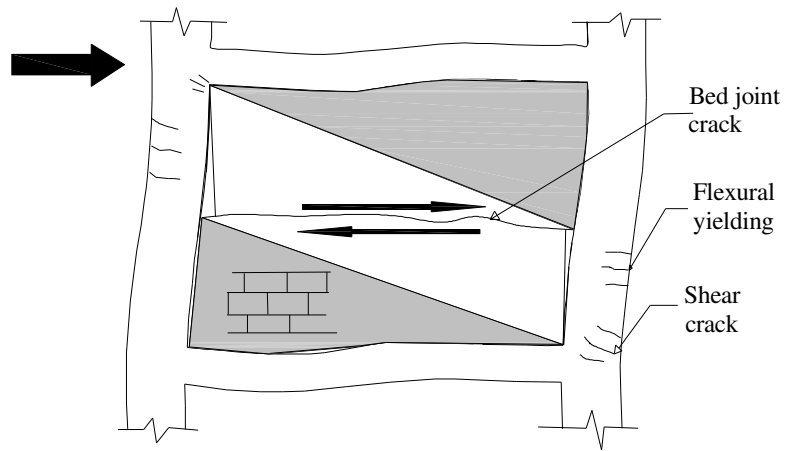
Knee-braced frame model for sliding shear failure of masonry infill.
